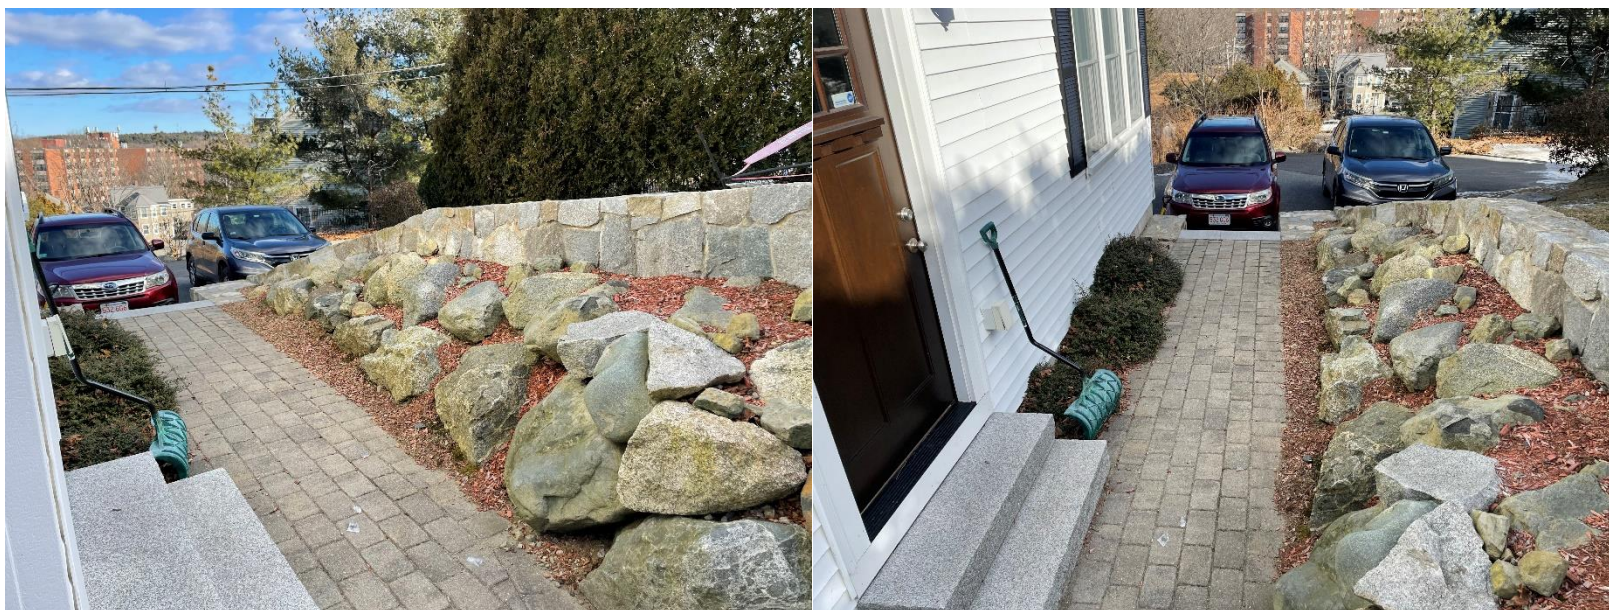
Exhibit C. Side of house. Note hill and associated retaining wall making an extension on this side not possible.
